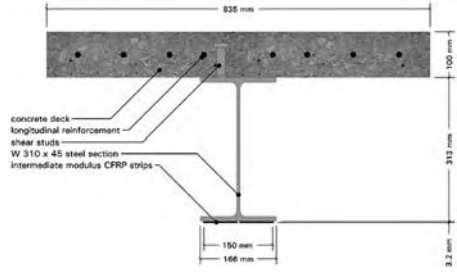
Cross-section of steel–concrete composite girder (CGAB-I).
